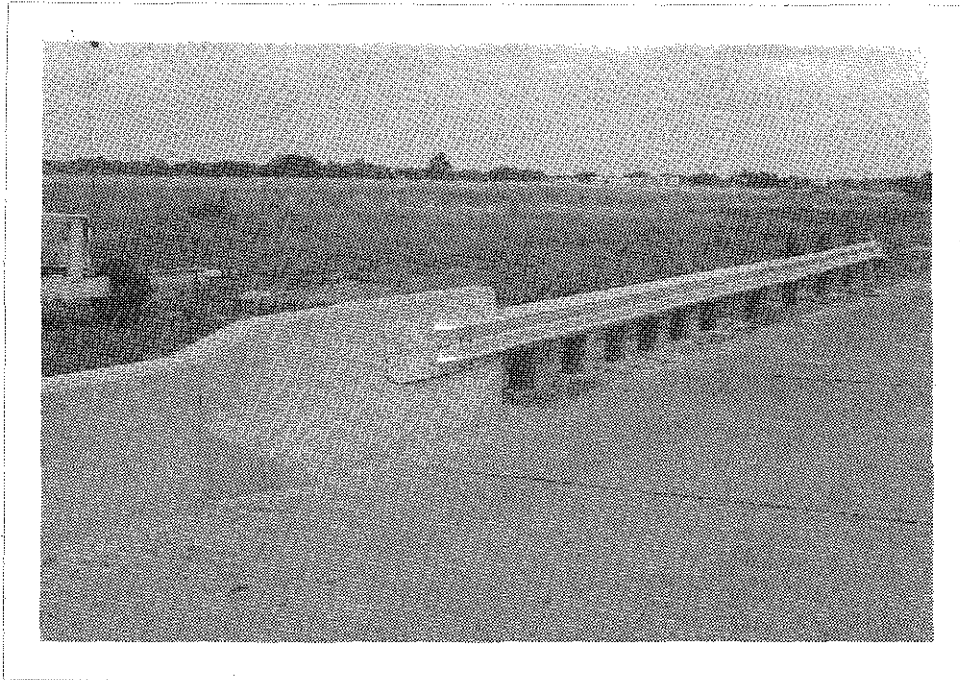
TUBULAR W-BEAM TRANSITION TO CSSB, TEST 2
